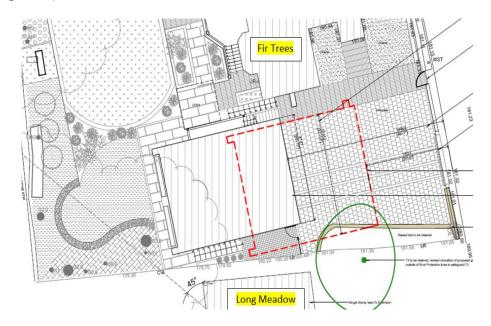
Amended Proposed Site Plan showing the garages initial (in red) and revised position.
